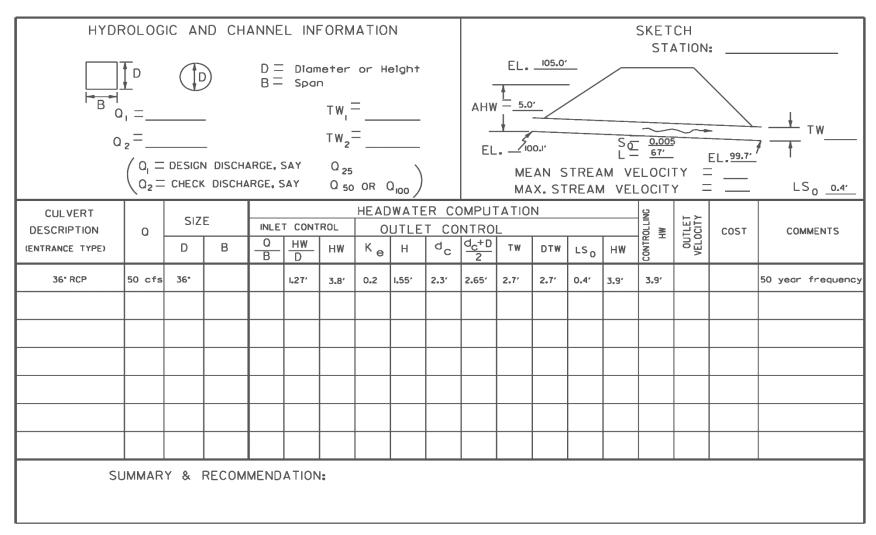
Culvert Capacity Worksheet for Example 4.7-1
